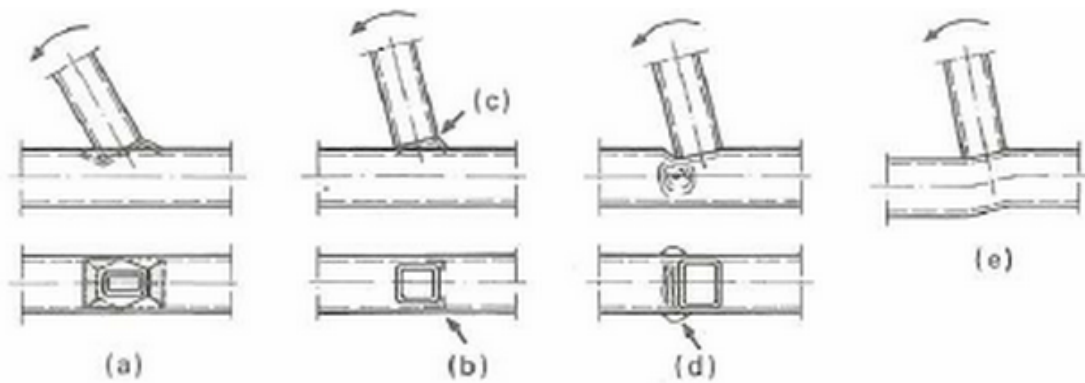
Possible Failure Modes for Brace-to-Chord Joints of Vierendeel Trusses Loaded by Brace In-Plane Bending Moment (Wardenier, 1982)
